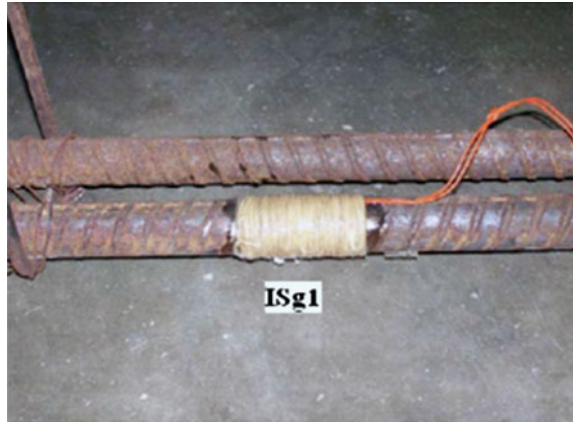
Location of internal strain gauge in longitudinal steel and stirrups
